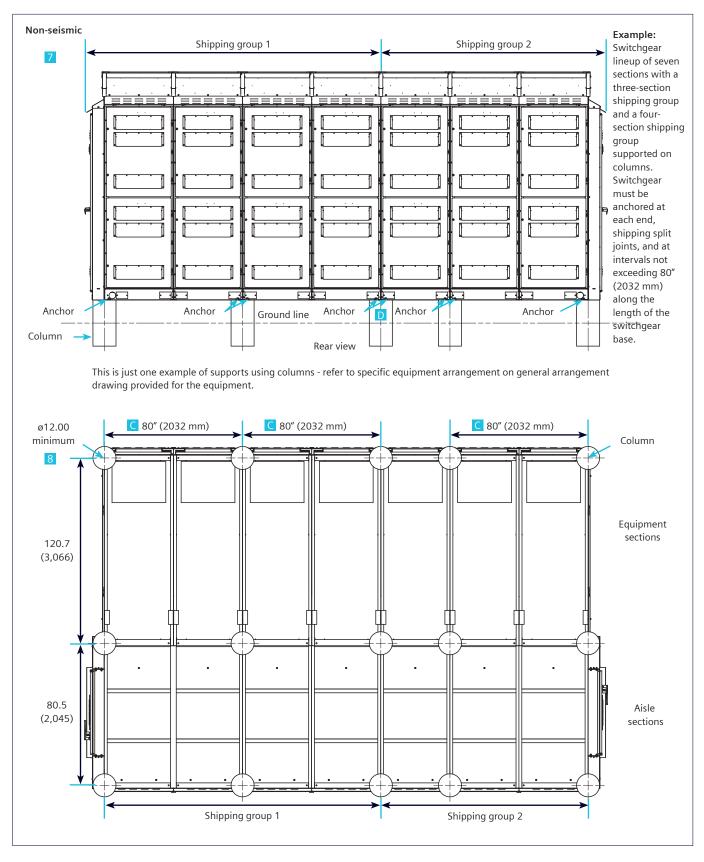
Anchoring outdoor type SGM-SG-AR Shelter-Clad single-aisle switchgear rated 27kV (continued)
